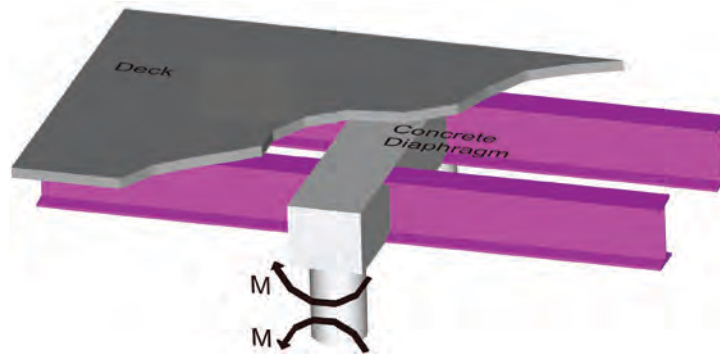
Transfer column moment to the concrete diaphragm through an integral connection.
